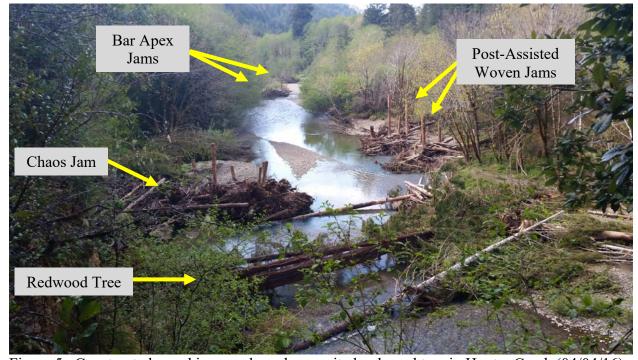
Constructed wood jams and newly recruited redwood tree in Hunter Creek (04/04/16).
